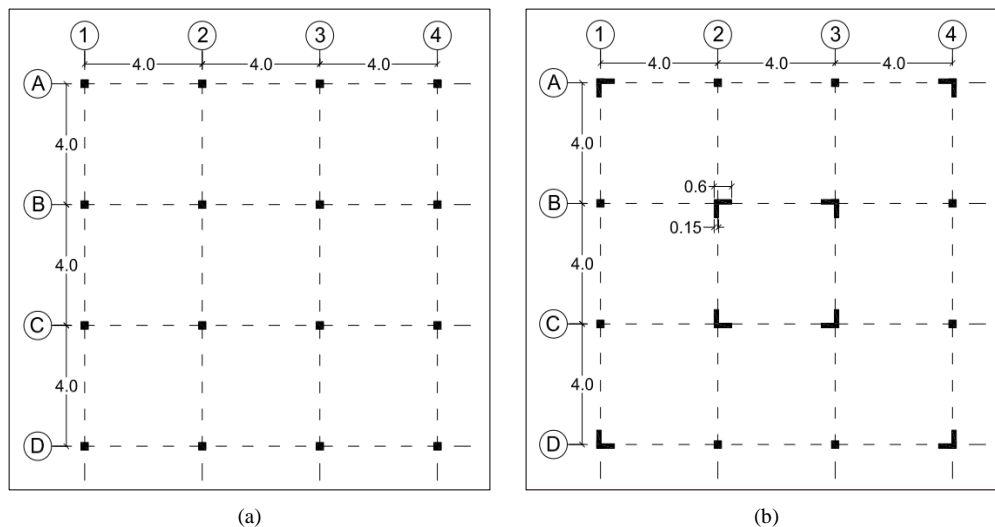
Structural plan of (a) column bracing (b) shear wall bracing
